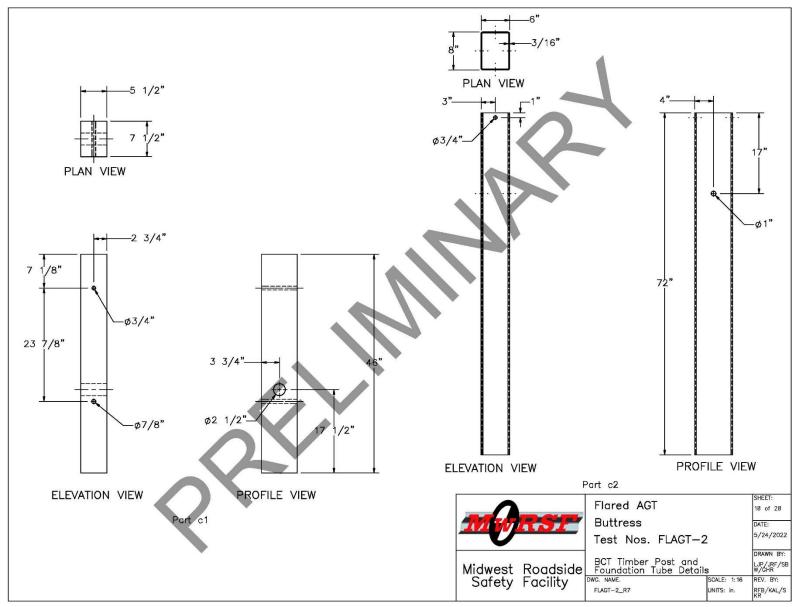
BCT Timber Post and Foundation Tube Details, Test No. FLAGT-2
